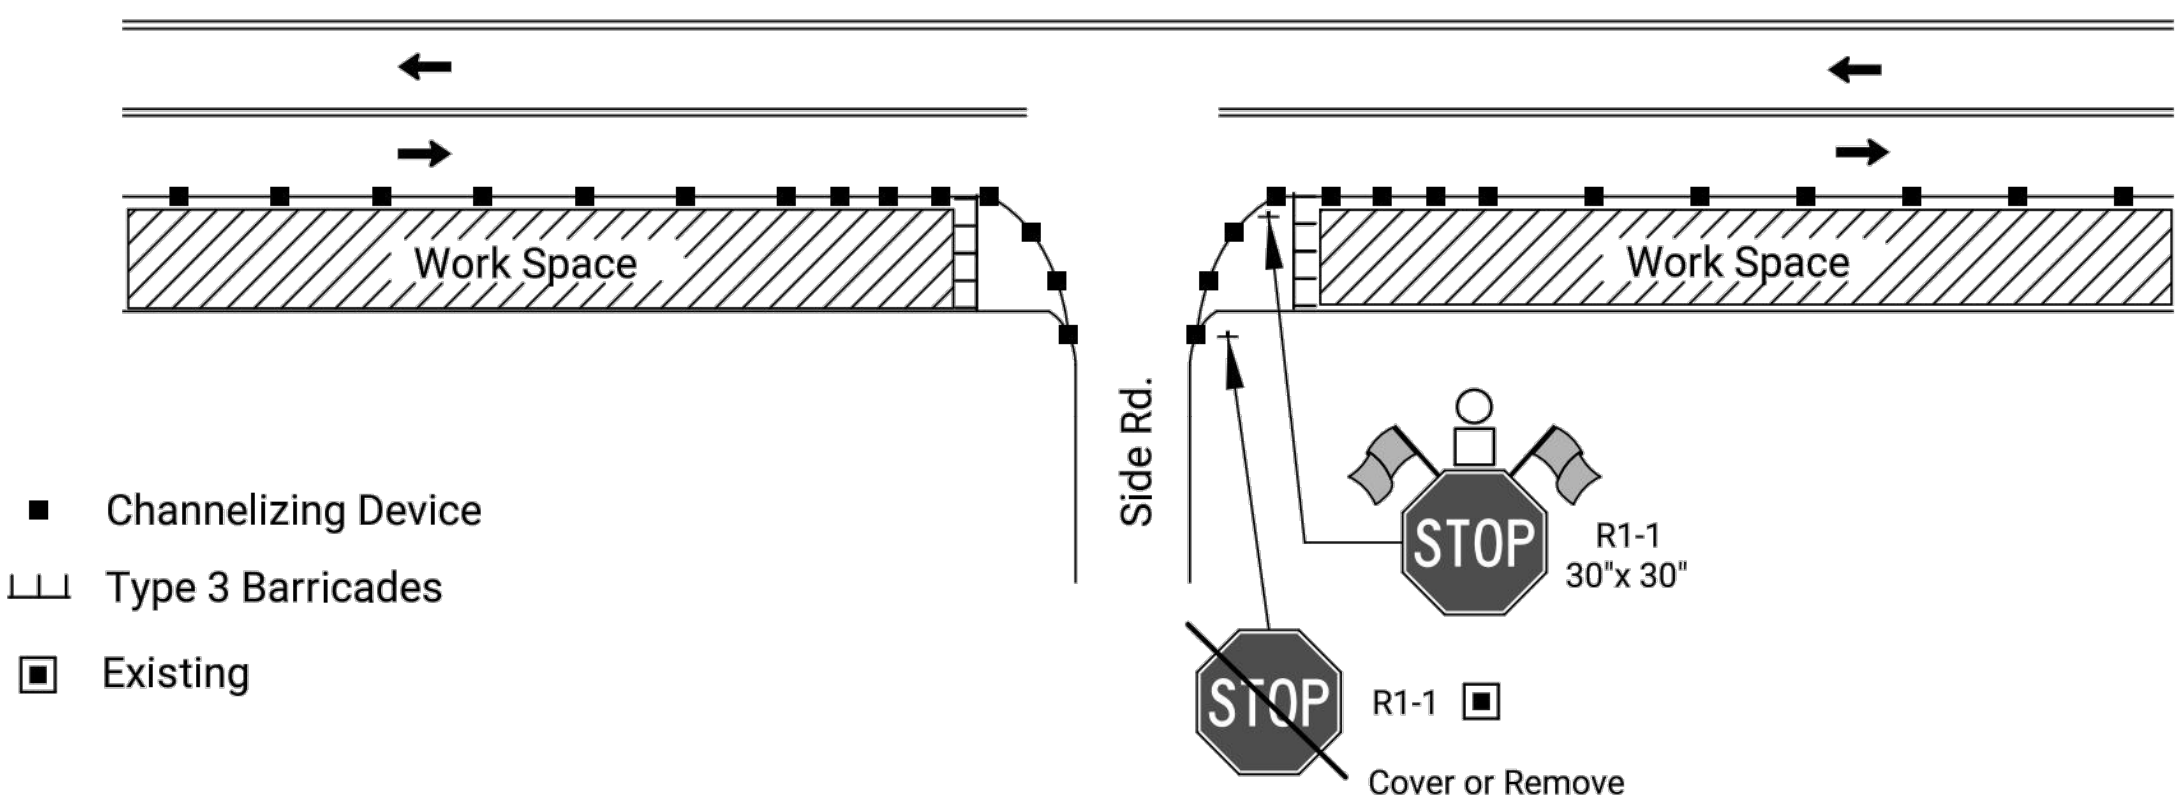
SIDE ROAD OR ENTRANCE OPEN THROUGH WORK AREA
